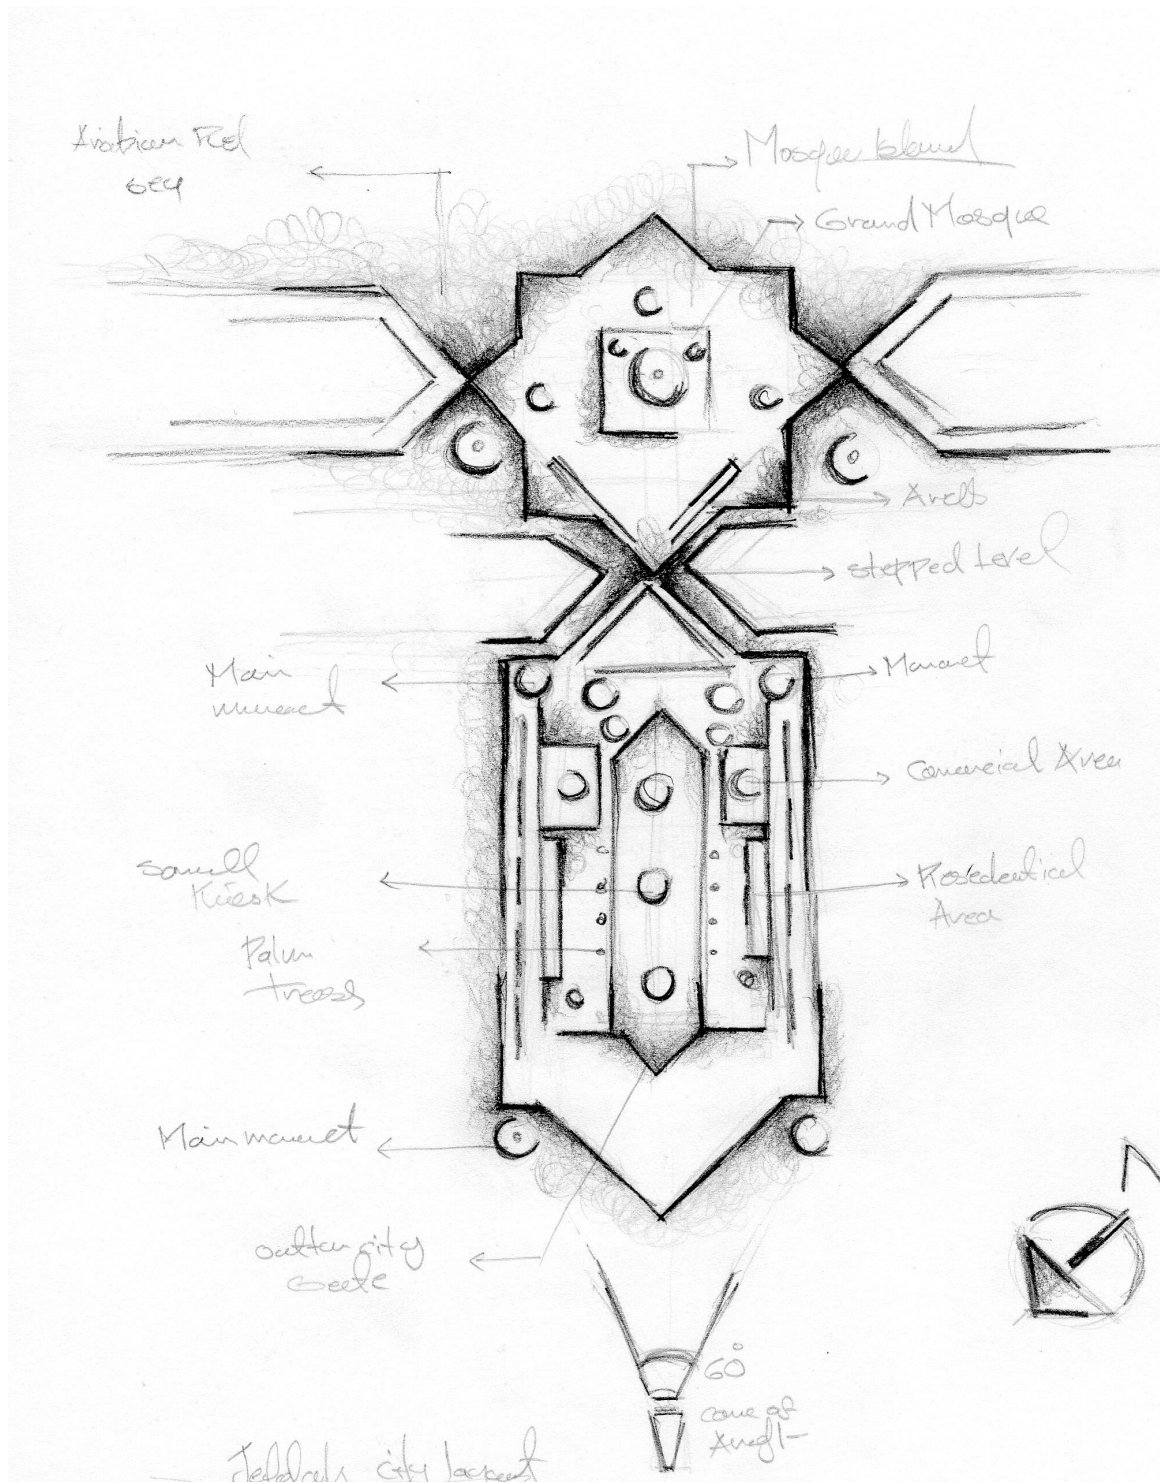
Detailed sketch of the traditional city of Jeddah top architectural layout planning
